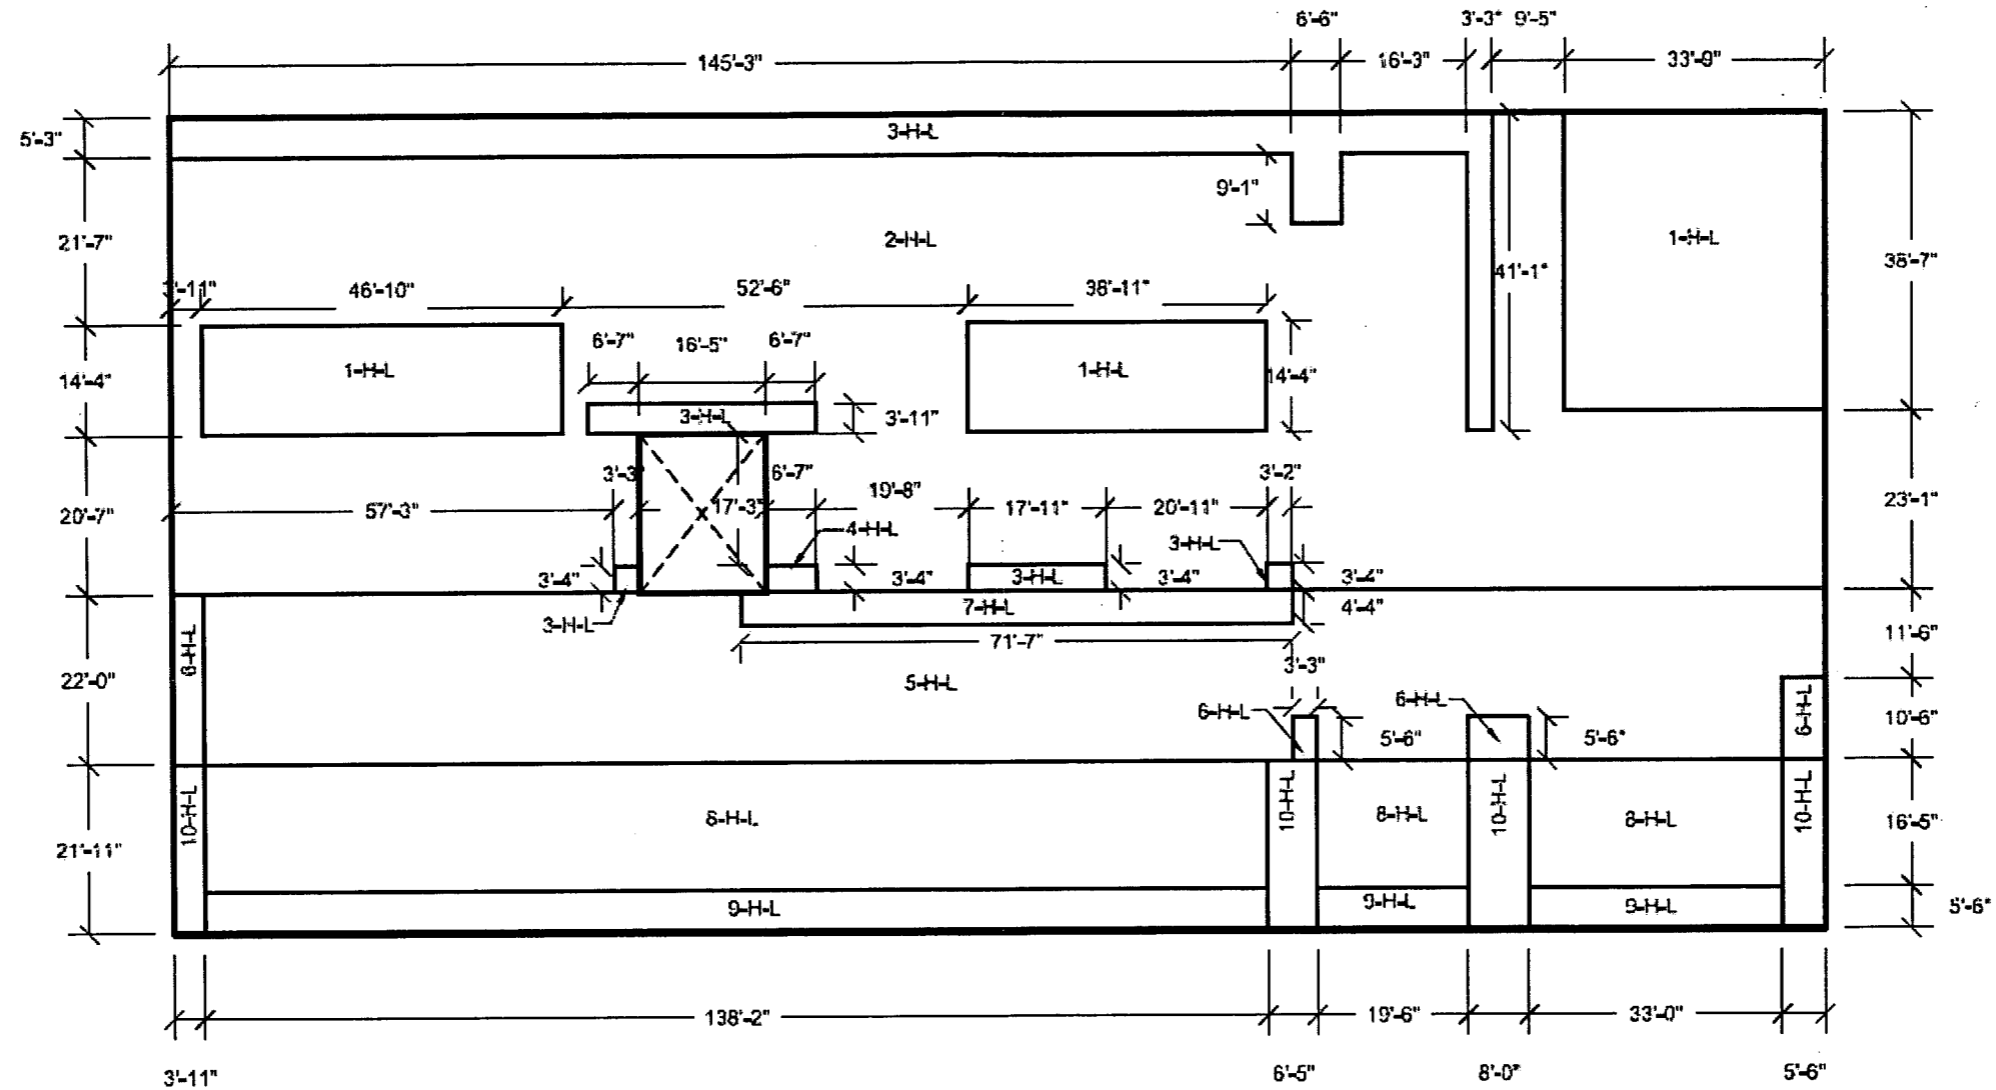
H.3-10: NORTH WALL LOOKING SOUTH
